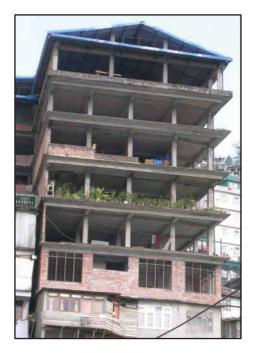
High-rise Concrete Frame Building Type in Arithang Ward
